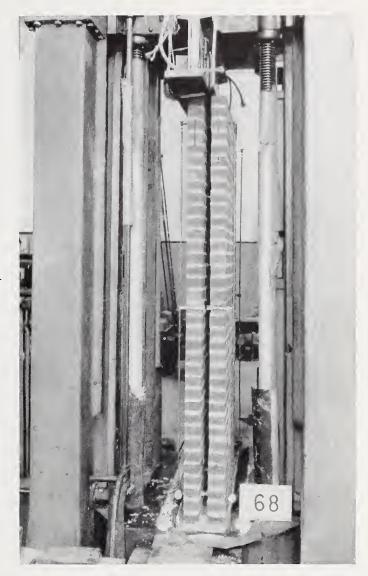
Wall specimen BD-C1a under compressive load, load applied to backing only.
